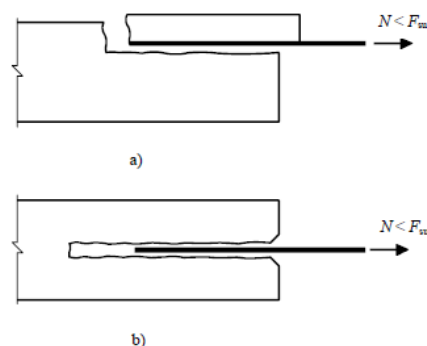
a. splitting failure b. pull out failure (FIB, 2008, p. 139)
